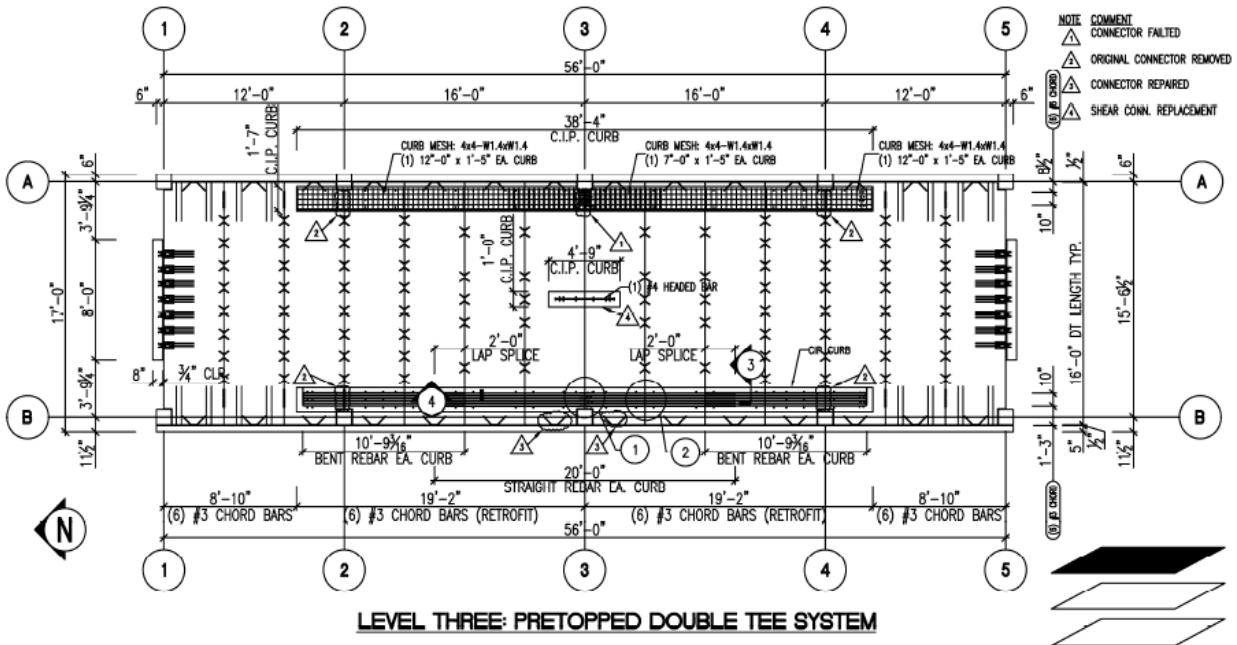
Plan for top floor repairing after dry chord fracture in test 6.
